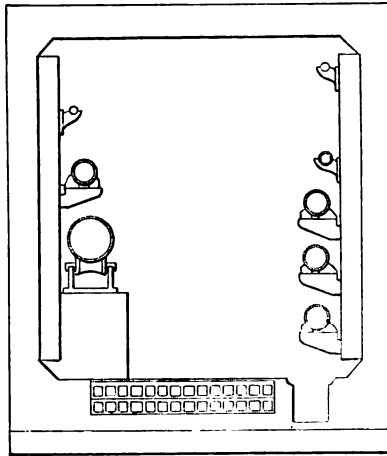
TYPICAL CROSS-SECTION OF PIPE AND CABLE TUNNEL
